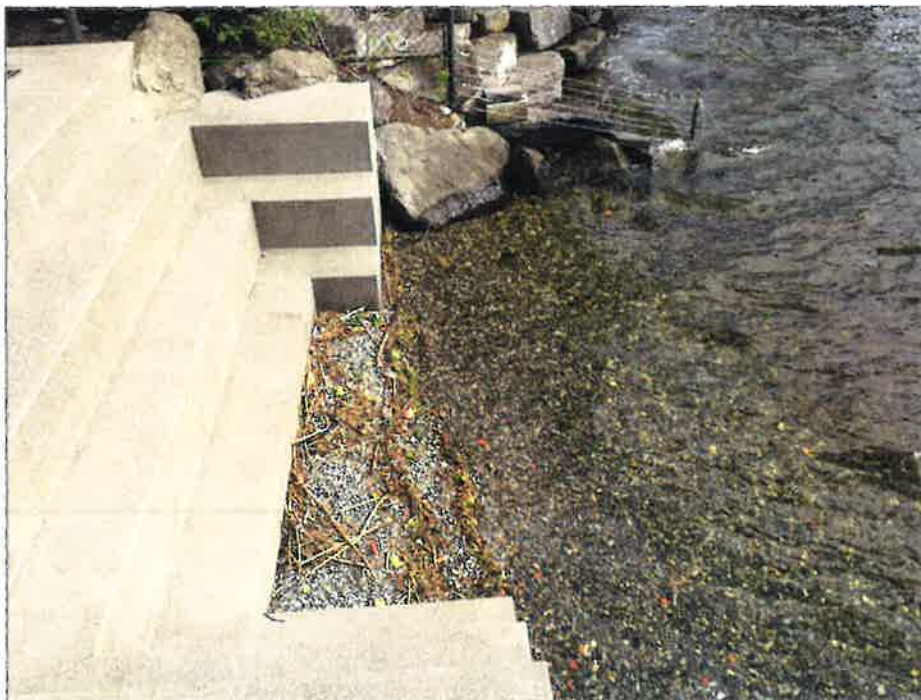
Detail of stairs and substrate on property shoreline. Photo shows red osier dogwood installed just east of stair area.
